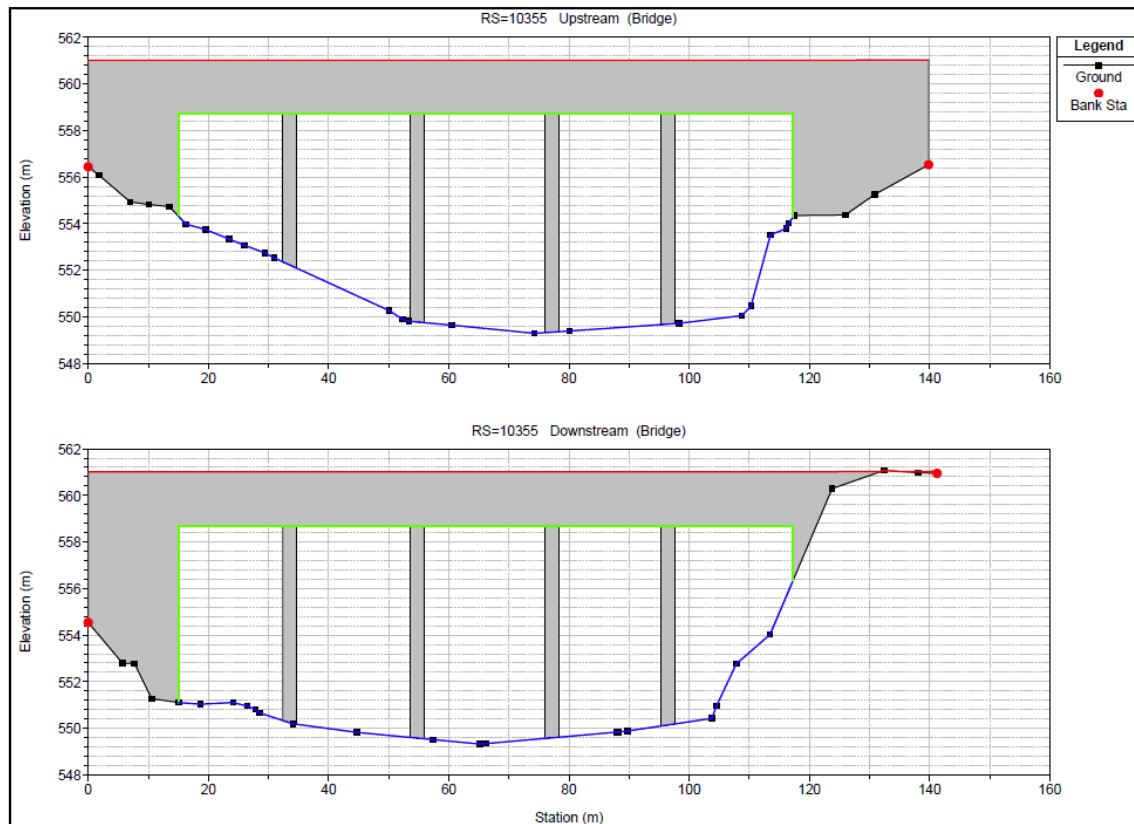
Cross Section of Balewadi Mumbai Pune Bypass Bridge on River Mula as generated in HEC-RAS
